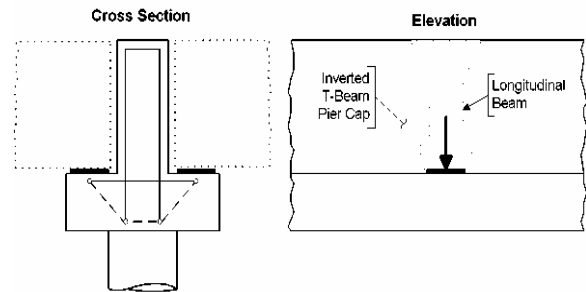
Inverted T-Beam Pier Cap.
